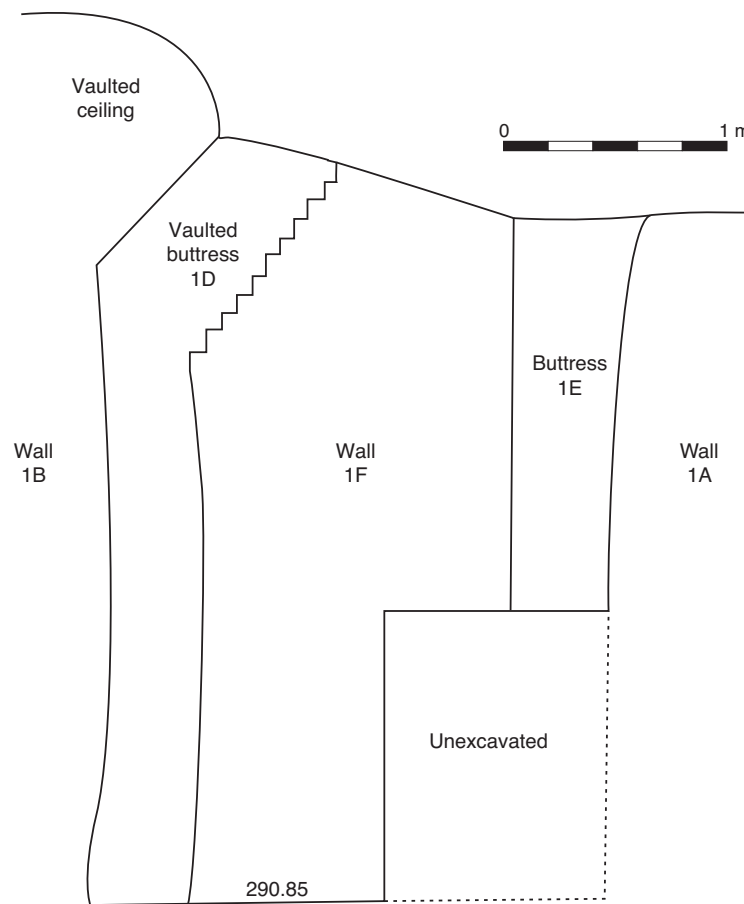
Level 4 Round Building, area 1, southeast wall, elevation.
